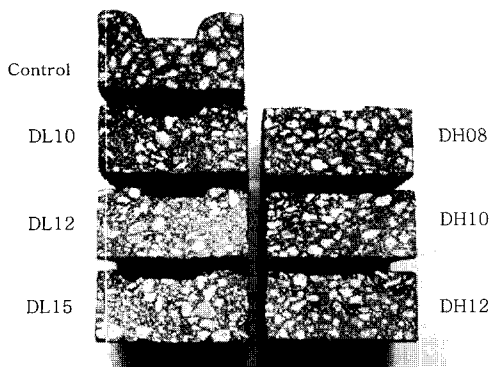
Photograph showing rut depth of different mixtures after wheel tracking test
